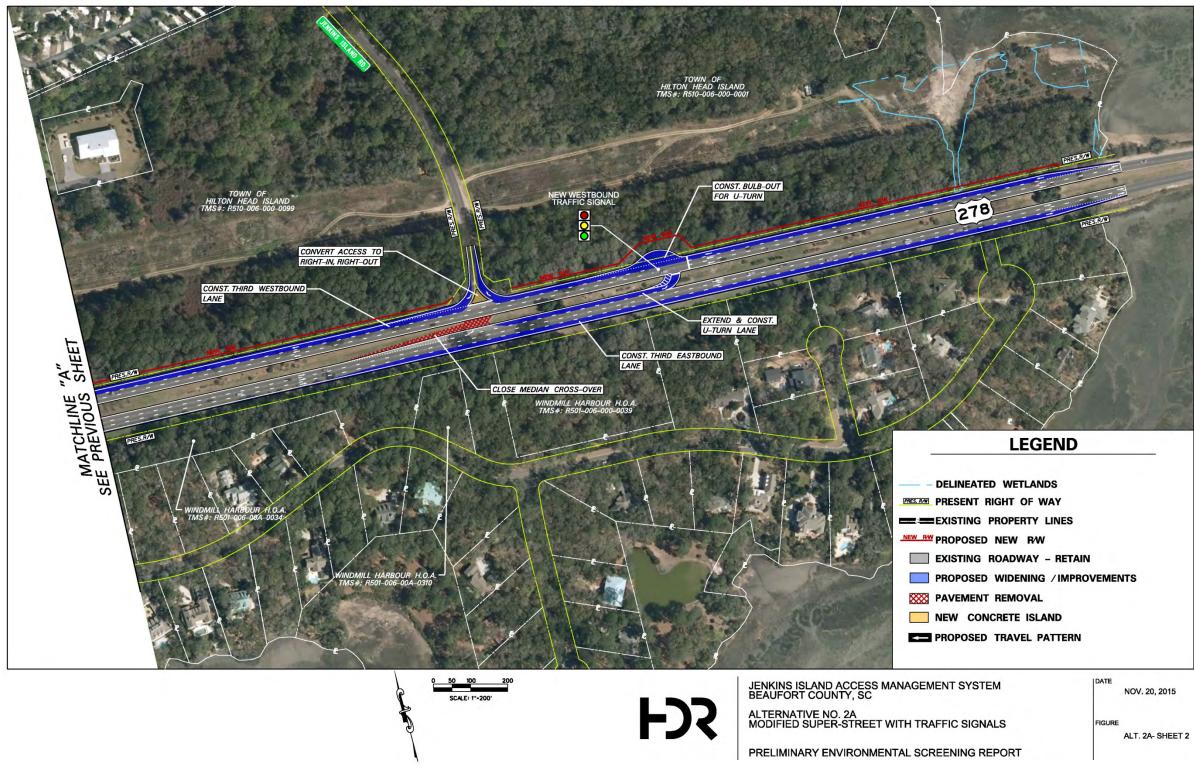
Alternative 2A (Sheet 2 and 2)
